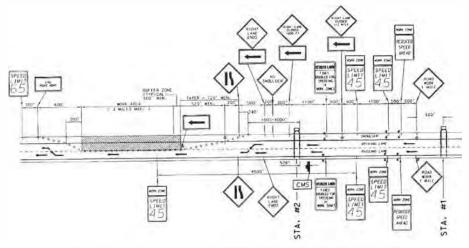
Typical work zone layout: source: New York State Thruway Authorby (NYSTA) foot to scale]
